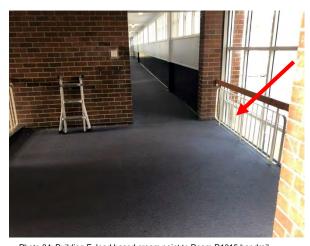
Building E, lead based cream paint to Room R1015 handrail
